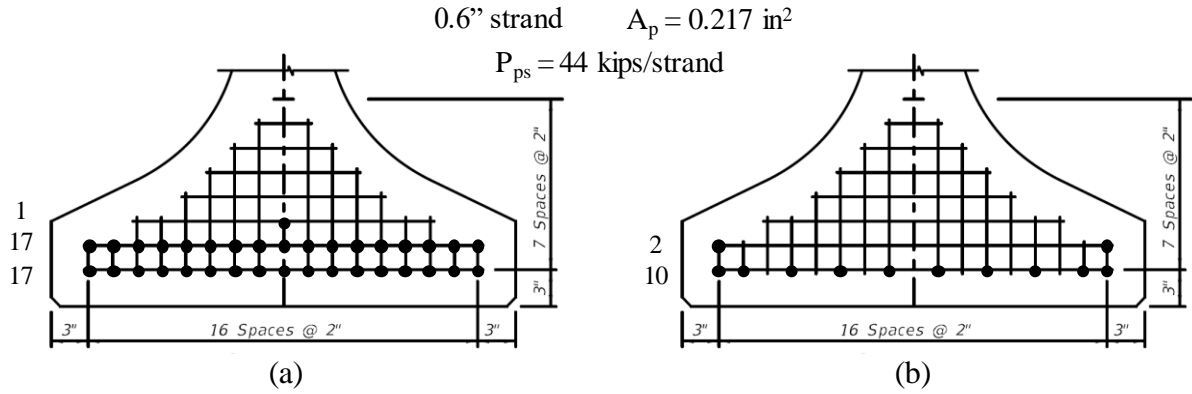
Strand layout for (a) 100-ft span and (b) 40-ft span
